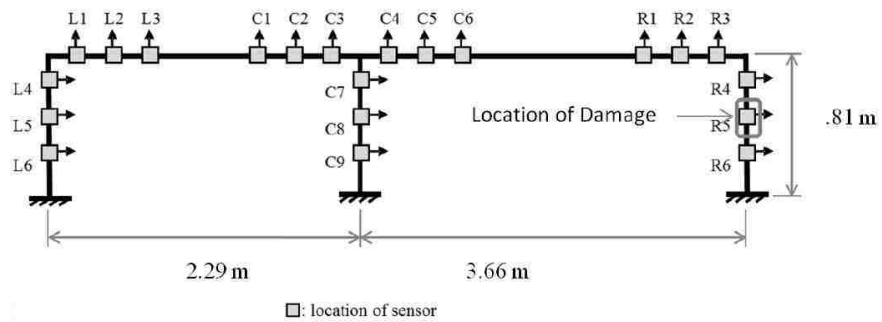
Sketch of the specimen and the location of the introduced damage
